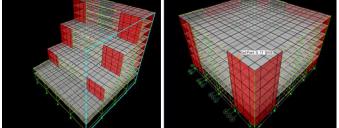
3D view of vertical irregular and Building with shear wall at corner of ground floor and ground floor stiffness altered
